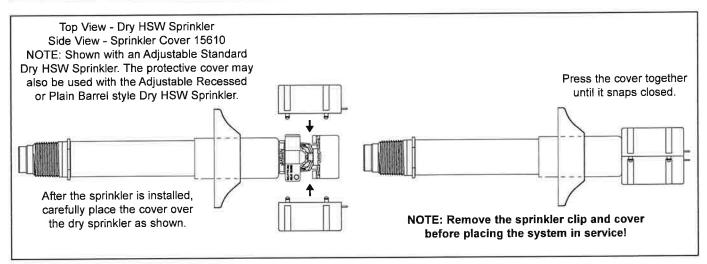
Dry Horizontal Sidewall Sprinkler Cover Part Number 15610 (shown with an Adjustable Standard Dry HSW Sprinkler) (Optional for temporary use with Viking Dry HSW Sprinklers until finish work is completed around the sprinkler.)
